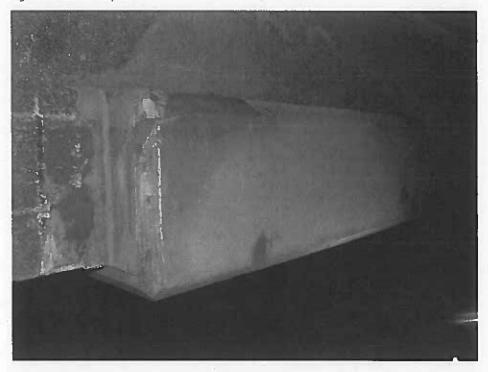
Typical Cast in Place Beam Repair (5/14/2019)
